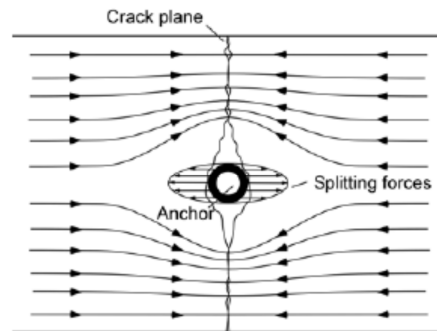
Compression load transfer around the anchor (plan view) (Hoehler 2006)
